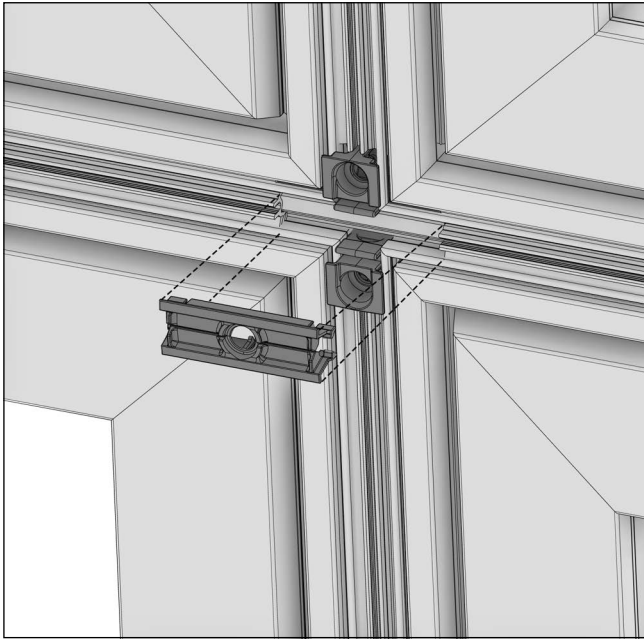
Multi-wide/multi-high assembly with mull cross plug
